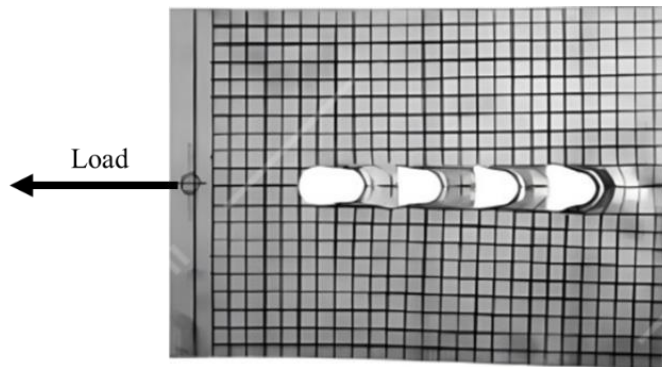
Bearing failure of the plate (Plakada basma hasarı) [19]
